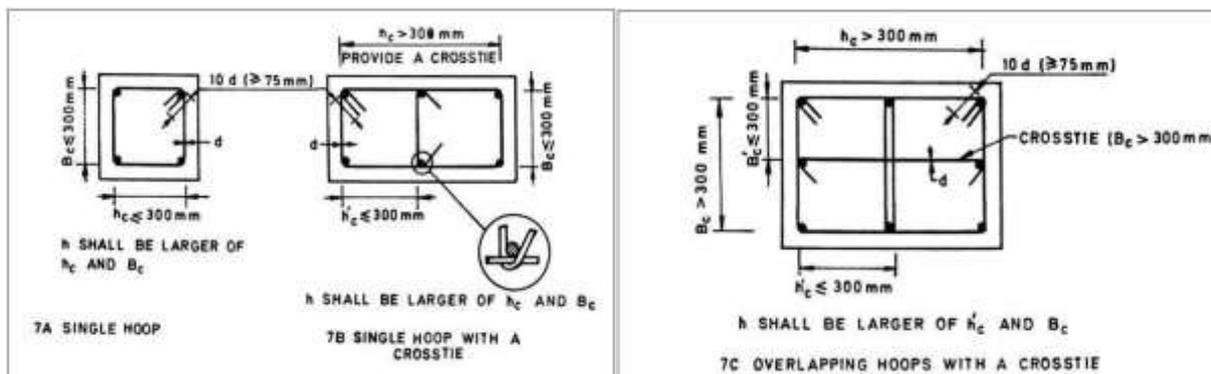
Transverse reinforcement in columns as per IS 13920(2002).
